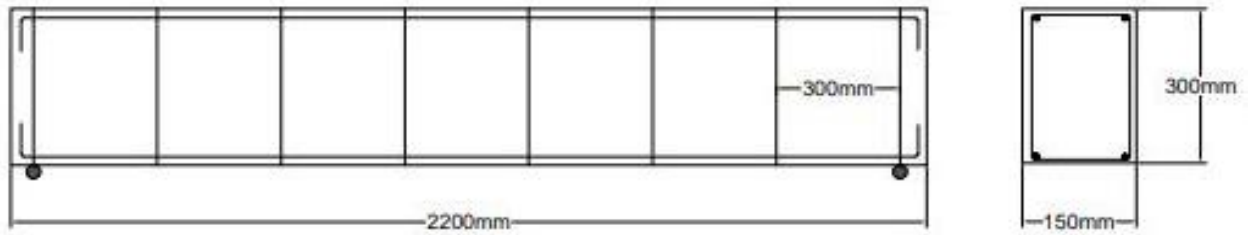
(a). Illustration of control solid beams (B1 and B7) without any opening and PVC pipe.
